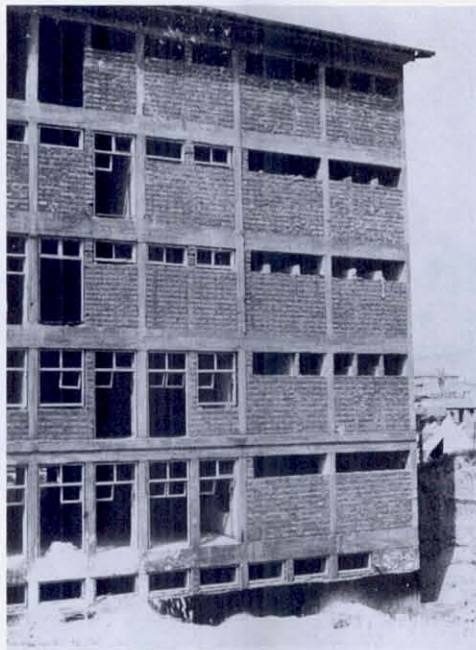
Several brick wall panels unattached to the structural frame fell out in the Medical Technology School, but had been replaced by the time this photograph was taken. There were very few instances of panels falling out in Burdur, even though in other buildings many panels were heavily cracked. This building, like the school across the street, had exterior basement columns fixed by basement walls over most of their height, but in this case there was no damage to them. Note the poor placement of concrete in the corner column.
